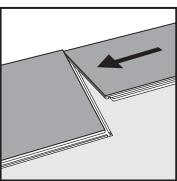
Second plank, first row Place next floorboard tight to the short end of the first one in the corner.
